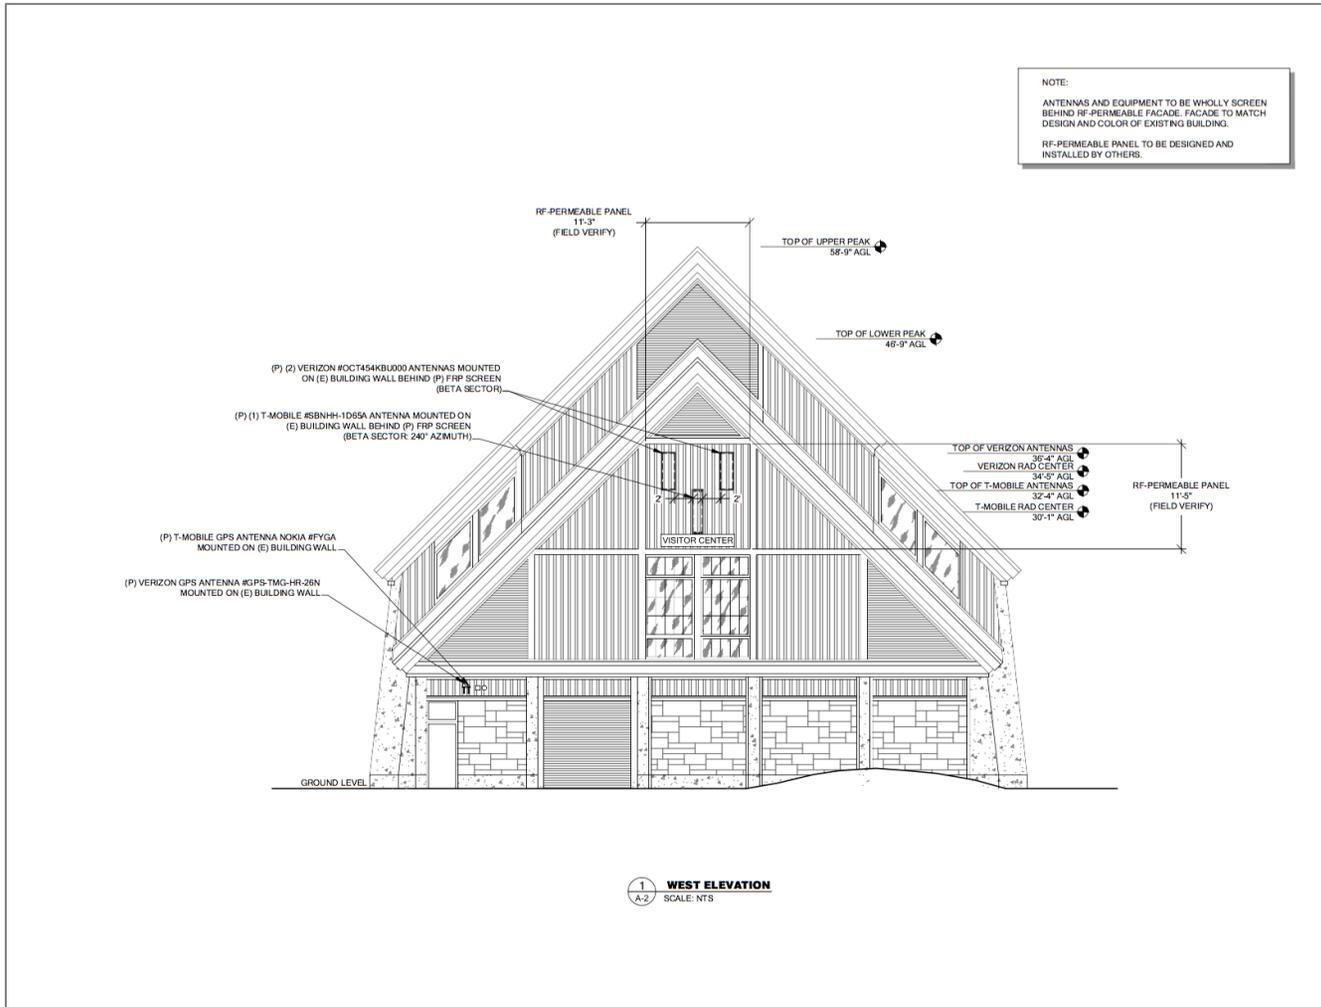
Jackson Visitor Center west elevation (looking east) showing RF Panel and antenna mounting locations. Antennas would be mounted in the building, and to the back of the panels, which are designed to be permeable. Antennas would be shielded from view. Proposed location of GPS antenna(s) is also shown (lower left).
